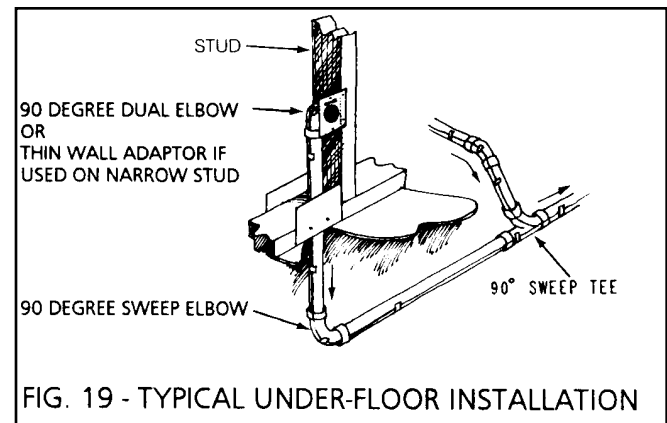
TYPICAL UNDER-FLOOR INSTALLATION
